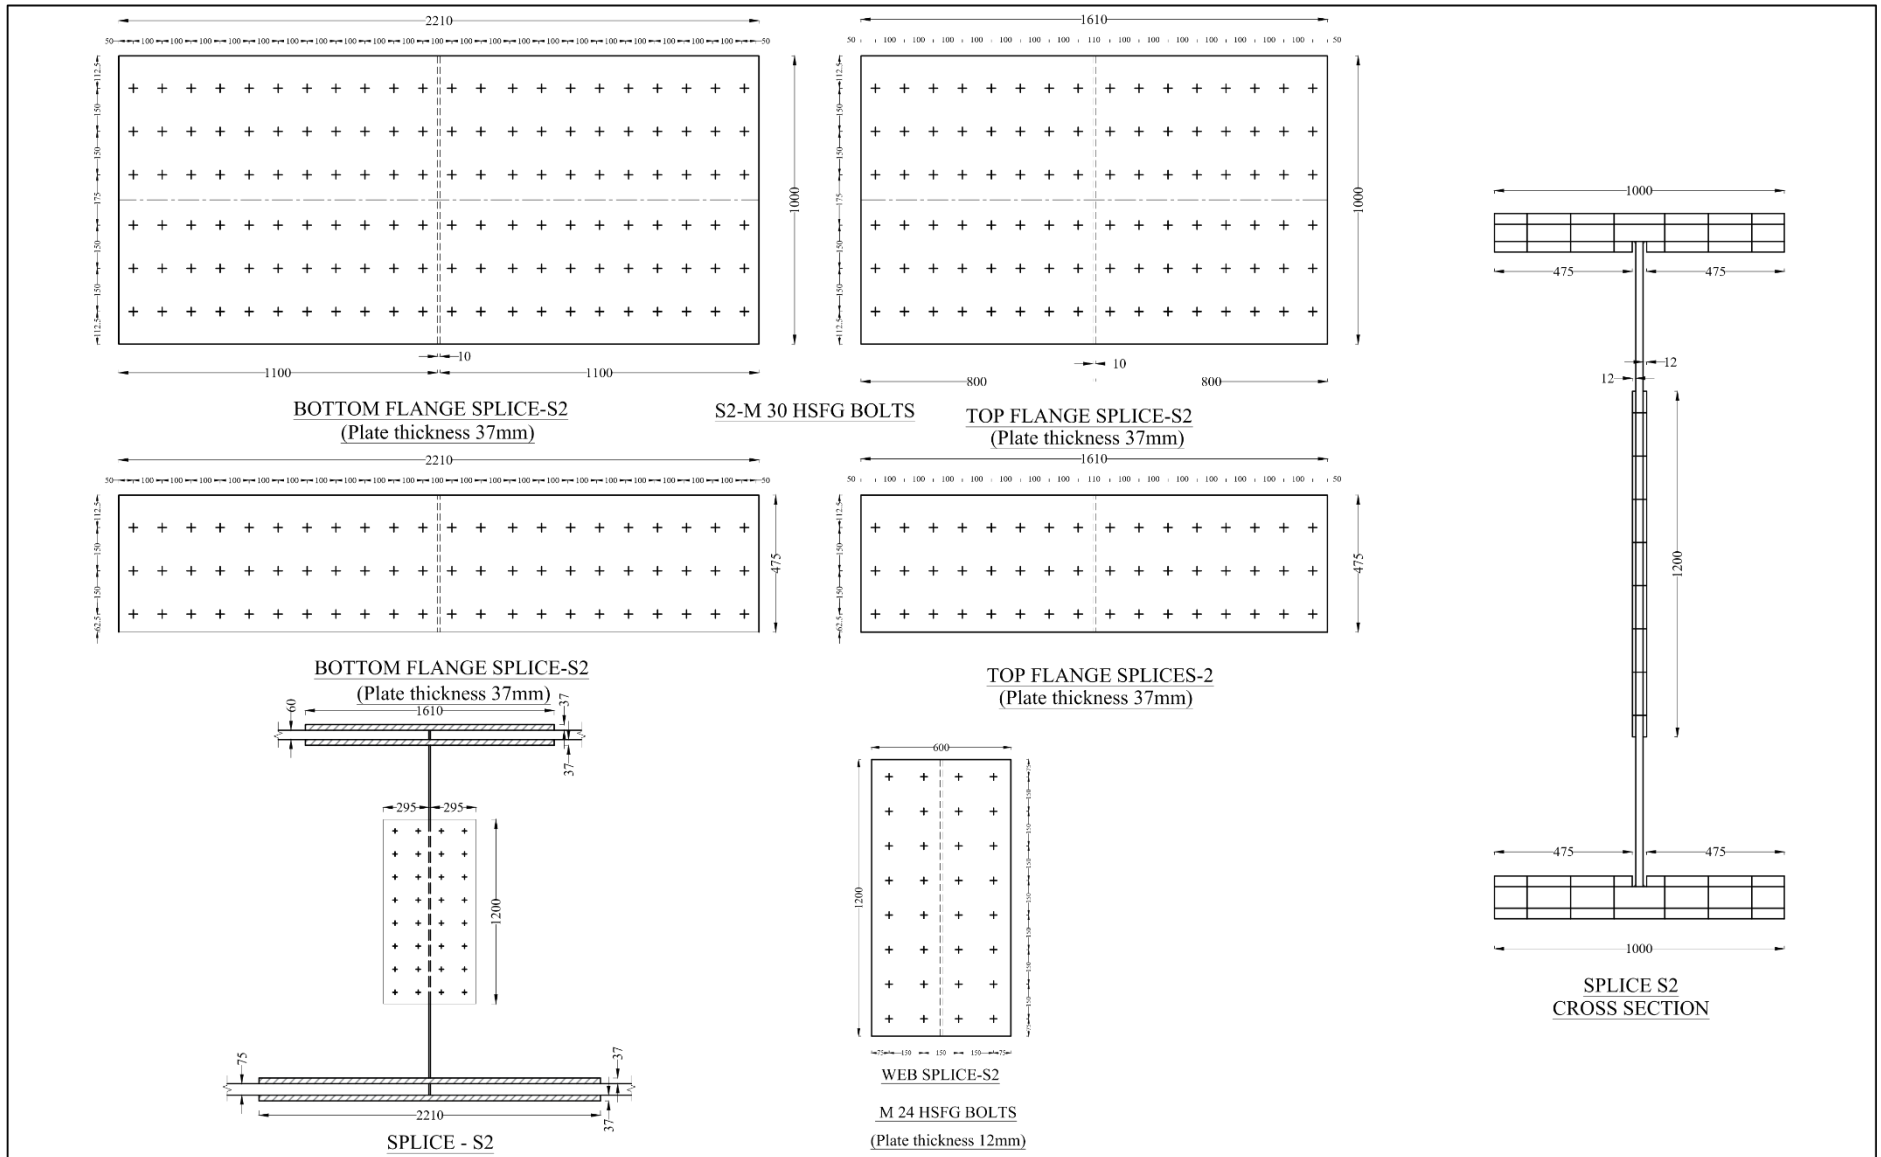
STEEL CONCRETE COMPOSITE LADDER DECK SPAN 50m
